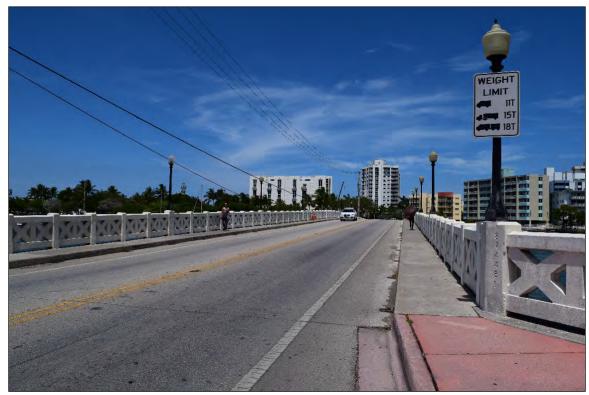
Existing Concrete Decking, Sidewalks, and Railings within the Archaeological APE at Venetian Causeway Bridge 12 (8DA14384), Facing East
